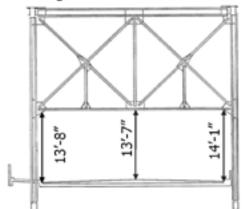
Cross-section view of a through truss bridge showing minimum vertical clearance.
